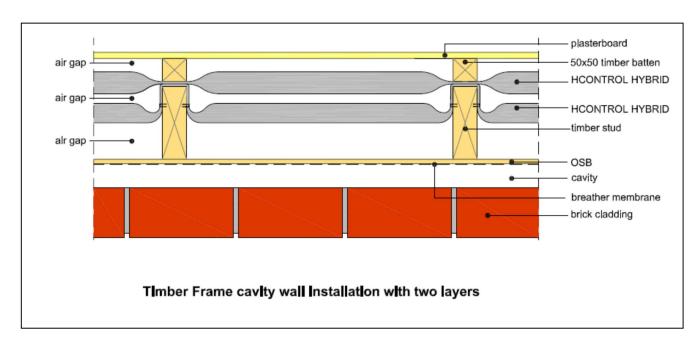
Two Layers of HControl Hybrid on Timber Frame Wall
